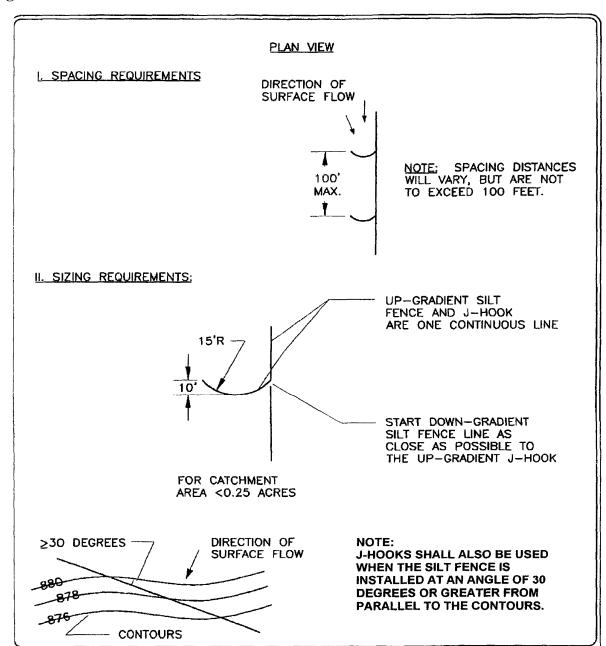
G.4 Silt Fence J - Hook Detail
